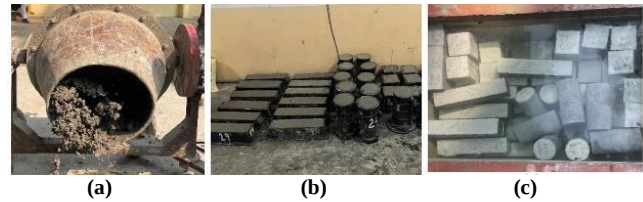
Images of (a) Concrete mixing, (b) Casted specimens and (c) Curing of specimen in water tank.
